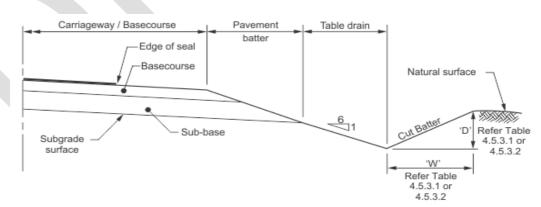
MRWA supplement to Austroads Guide to Road Design - Part 3)
